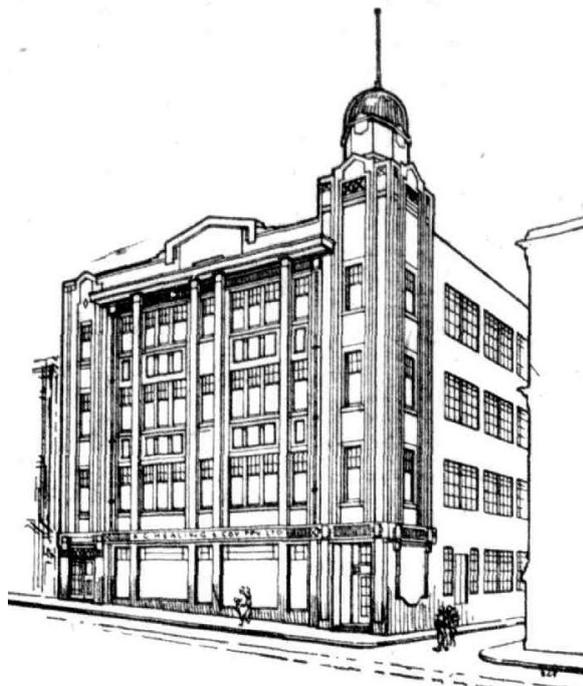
An impression of the building constructed for A G Healing & Co Pty Ltd in 1923 at 354-360 Post Office Place (today's 354-360 Little Bourke Street). The building actually constructed on the subject site differed to the plan shown, most obviously in being built as a six-storey structure, not four-storey and the deletion of the tower as depicted above. (Source: *Herald* 13 December 1922:16).
